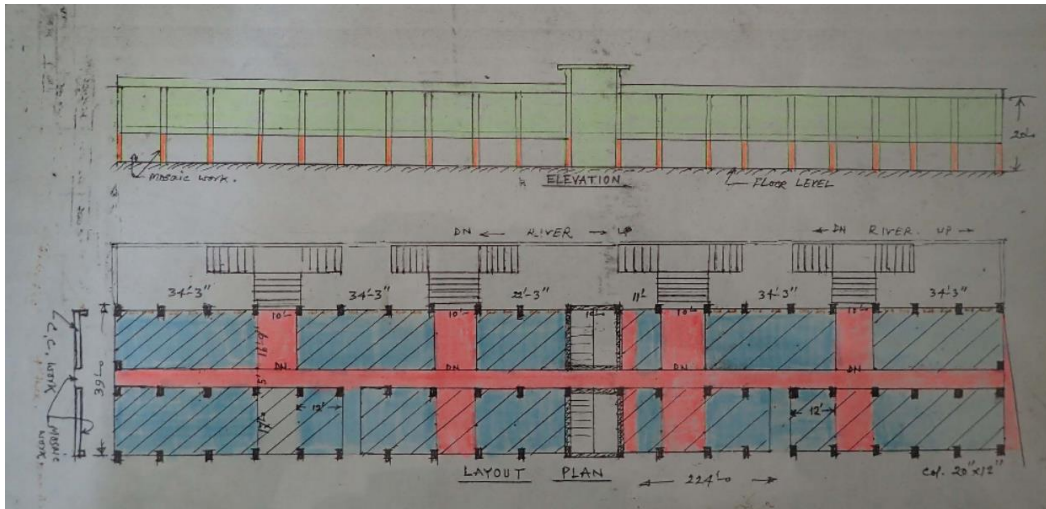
The layout of the existing fish handling shed (before collapse) (Source: CXB FLC data)
